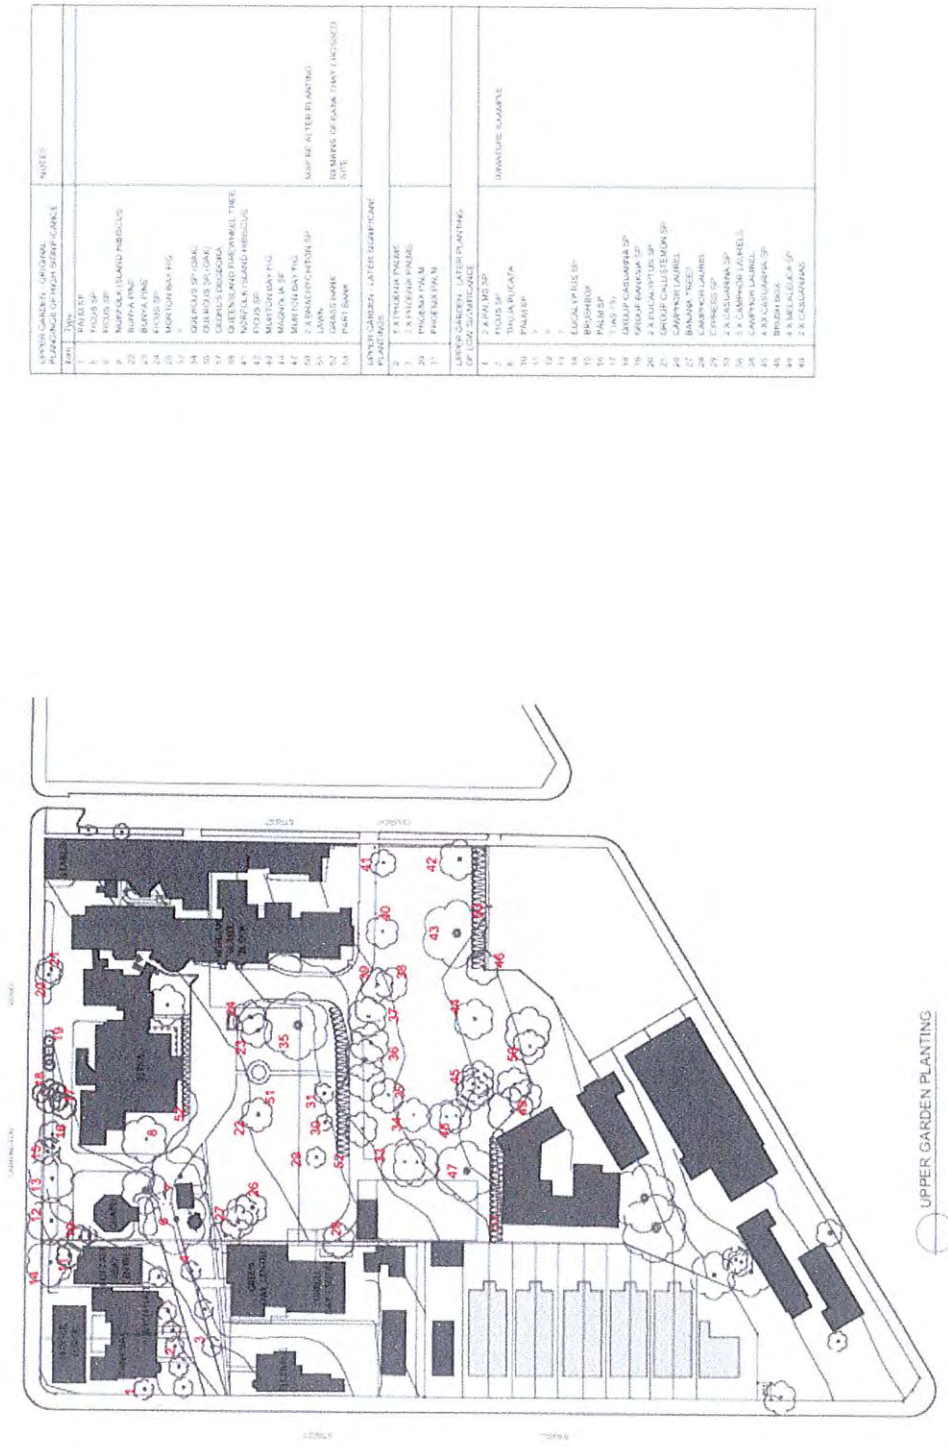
Site Plan showing landscape elements – Upper Garden
